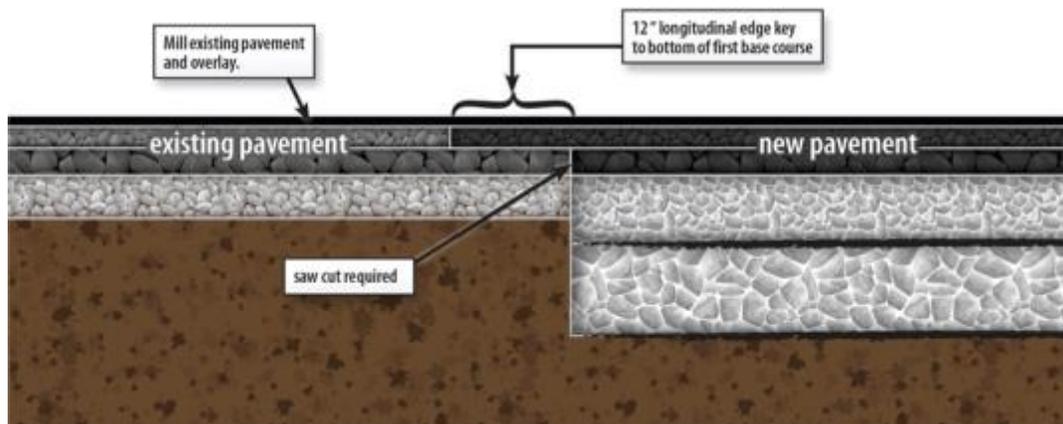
Notched edge cross section (courtesy of Kentucky DOT).
